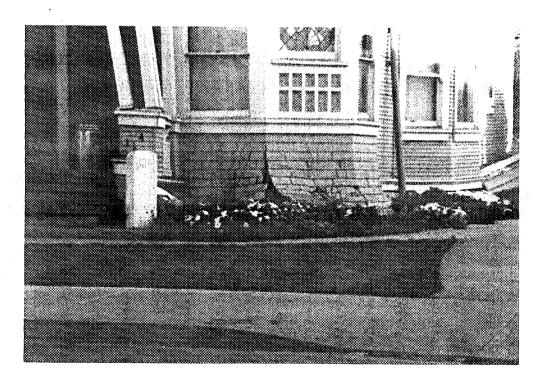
Close-up of cripple wall failure - 114 Brennan Street in Watsonville
